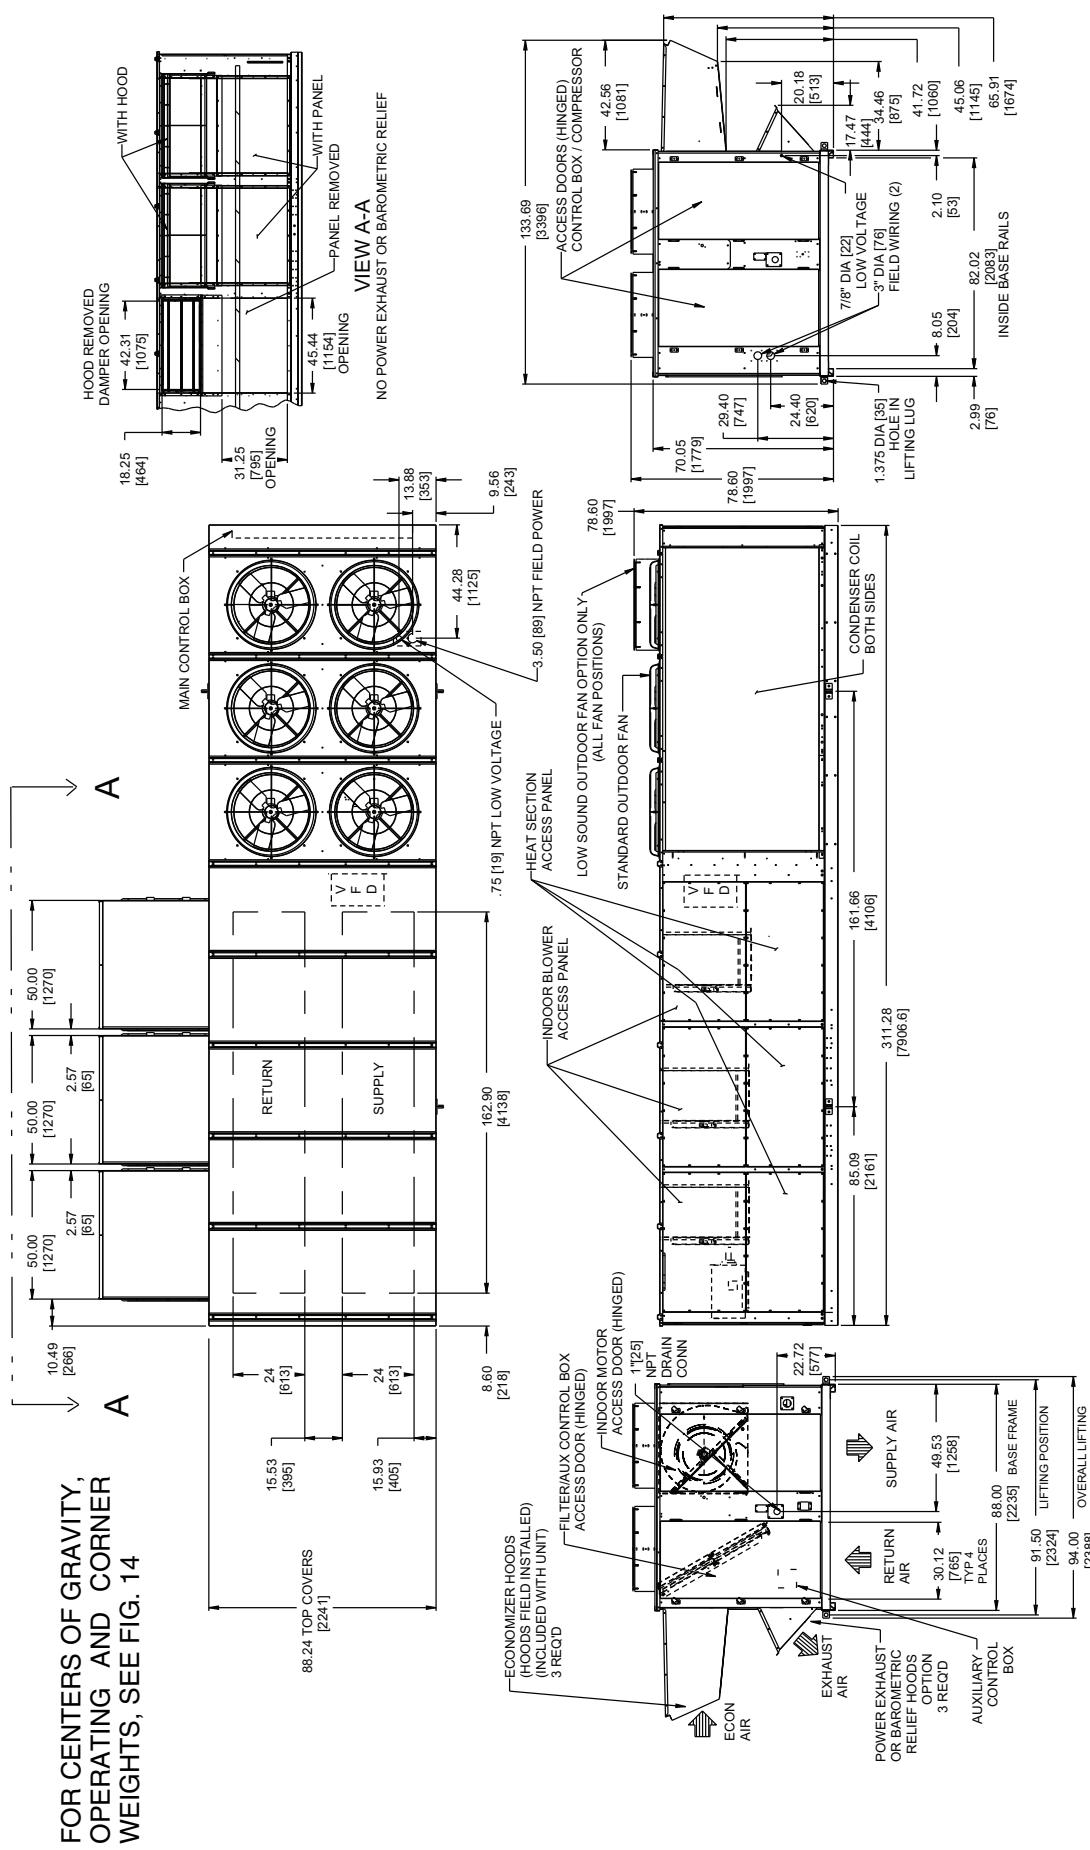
Base Unit Dimensions — 50A2,A3060 RTPF
